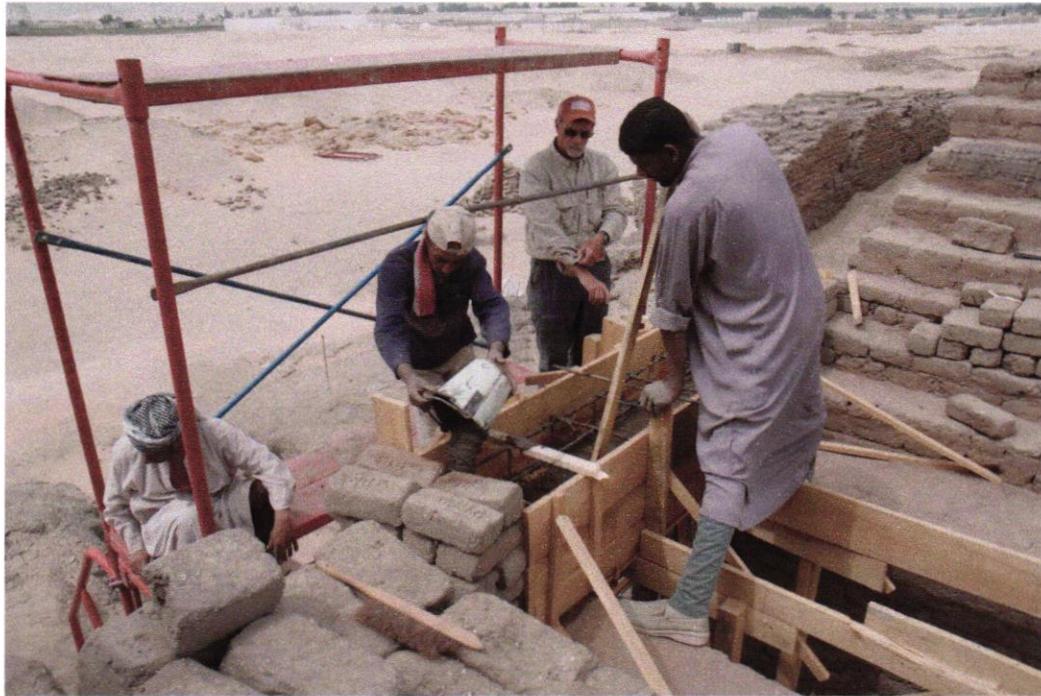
Steel reinforcement was placed inside the forms and the concrete for the lintels poured.
